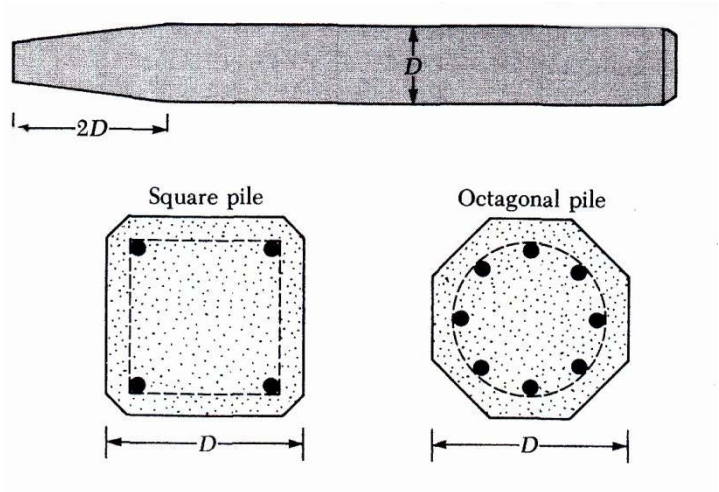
Precast piles with reinforcements (after Das 1999)
